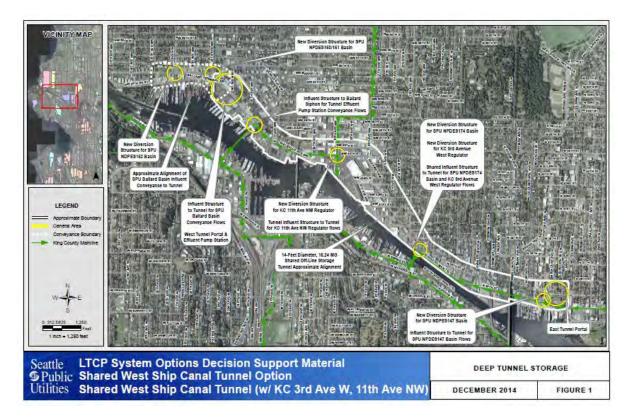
Neighborhood West Ship Canal Tunnel facilities layout
